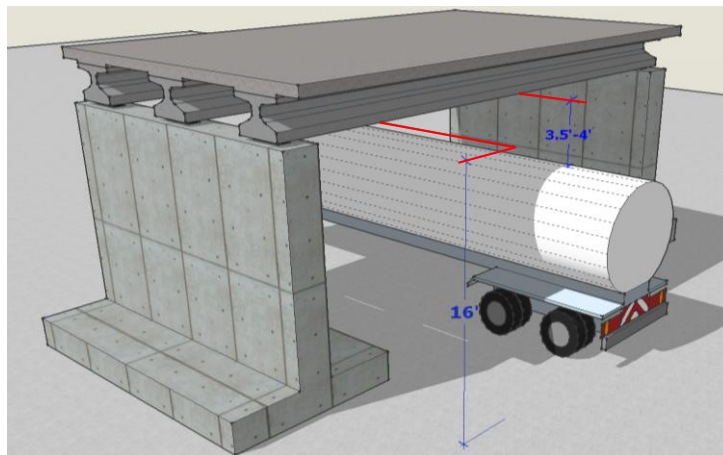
Original proposed supporting walls and fuel tanker trailer
